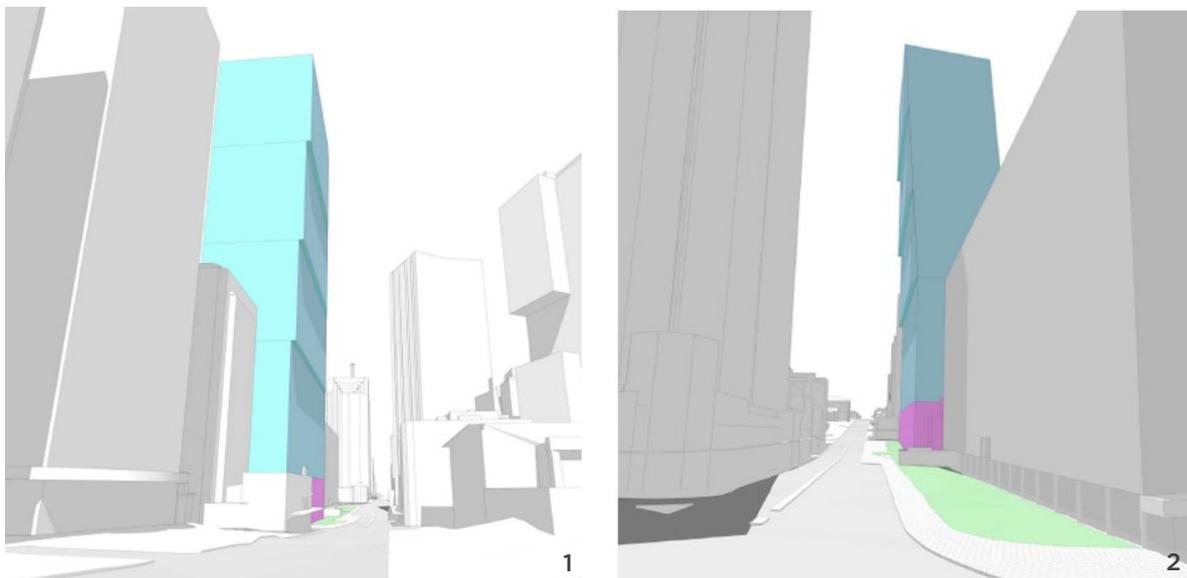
View of building envelope: 1. Looking south along Miller Street from the western side of the footpath, north of Berry Street. 2. Looking north along Miller Street from the junction with Pacific Highway.
